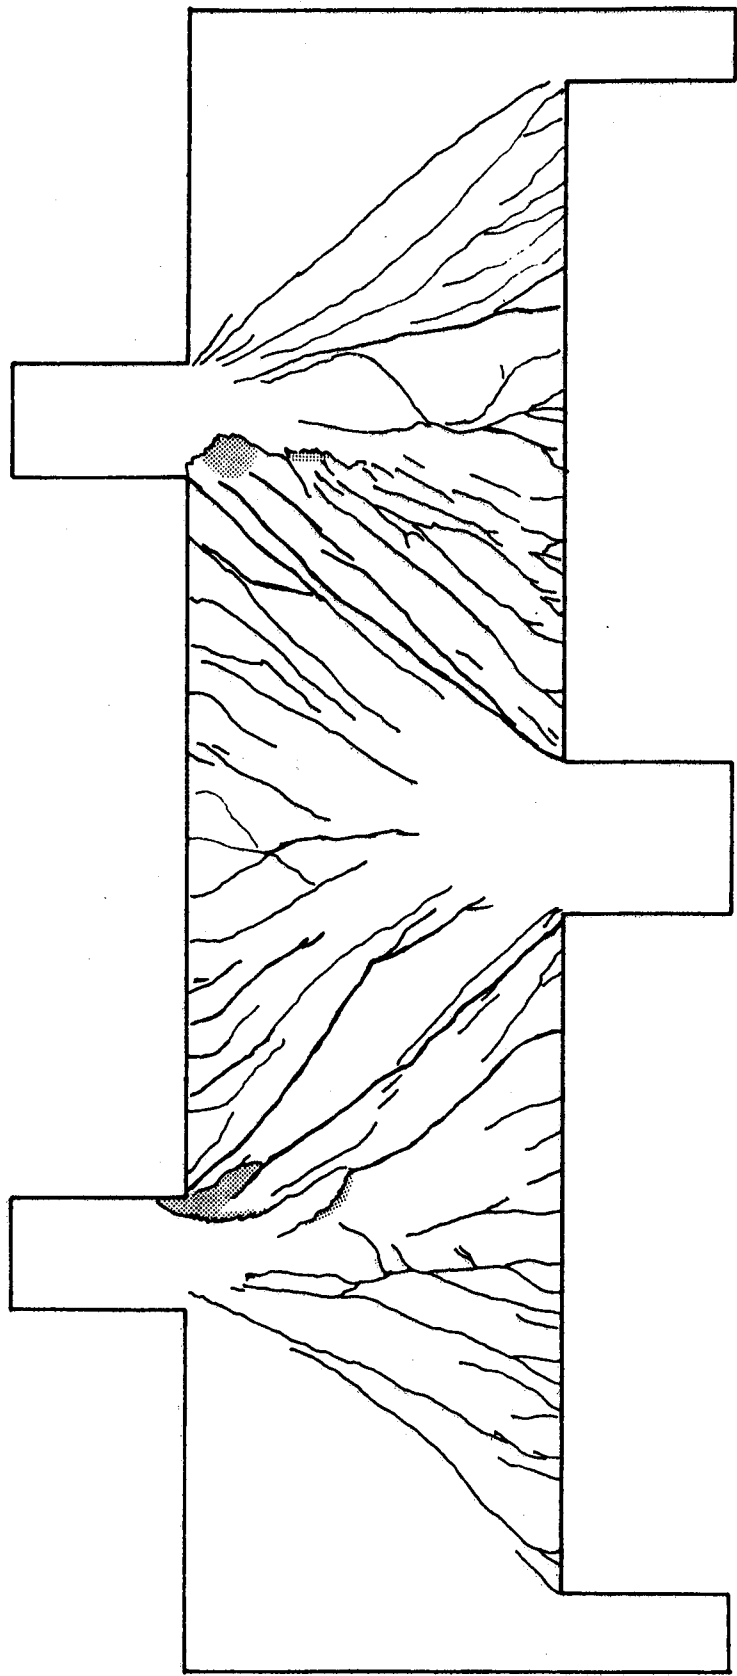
Beam 5/1/1.0 Crack Pattern – West Face
